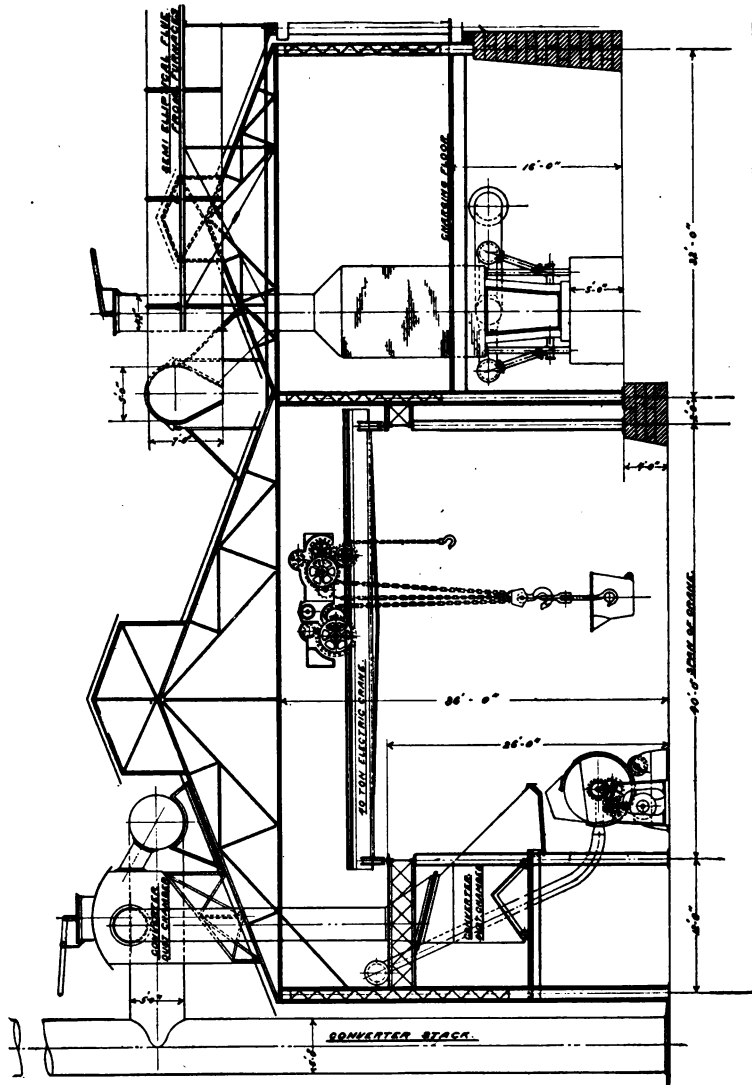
COPPER SMELTING AND CONVERTING PLANT. ELEVATION.
